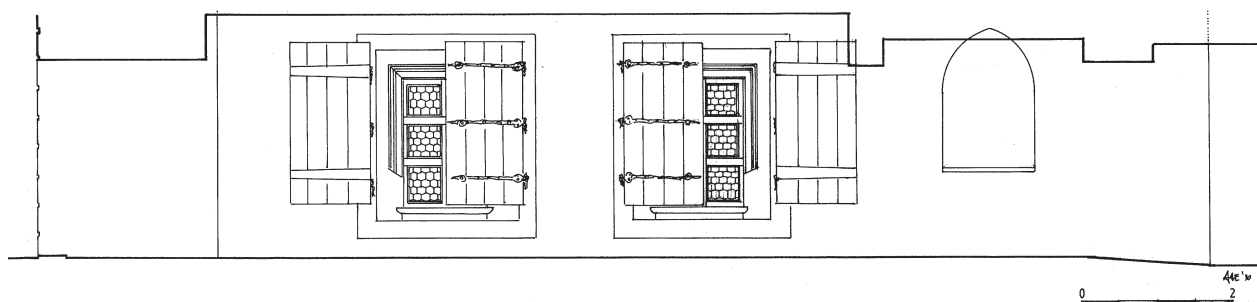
Reconstruction of a part of the ground floor in the south elevation after remodeling in 1547 (by A. Legendziewicz)
